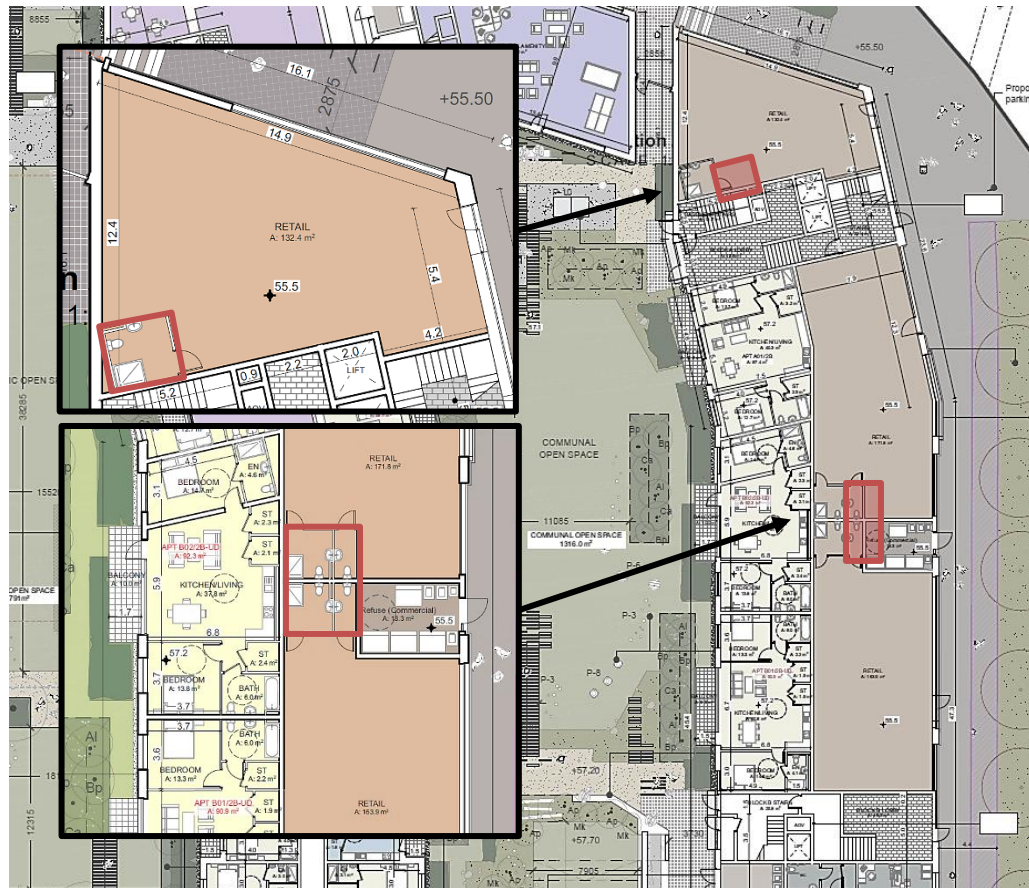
Proposed Shower/Changing Rooms at Retail Units at Blocks A and B
